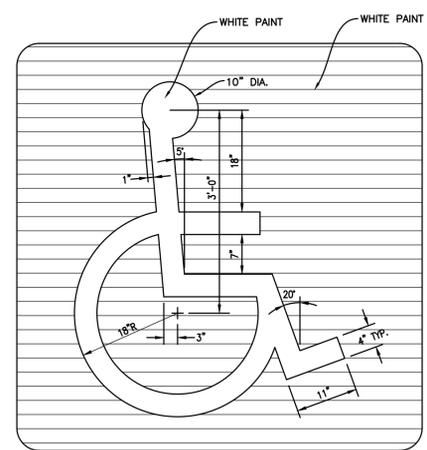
ADA ACCESSIBLE PARKING SIGN DETAIL
